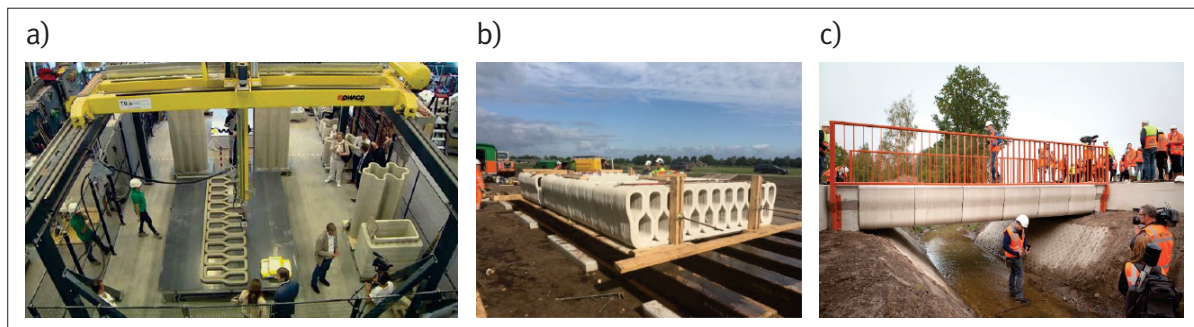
3D concrete technology, a) concreting bike bridge beams [6], b) beams ready for transport [6], c) bike bridge in the Netherlands made by 3D concrete technology [8]
